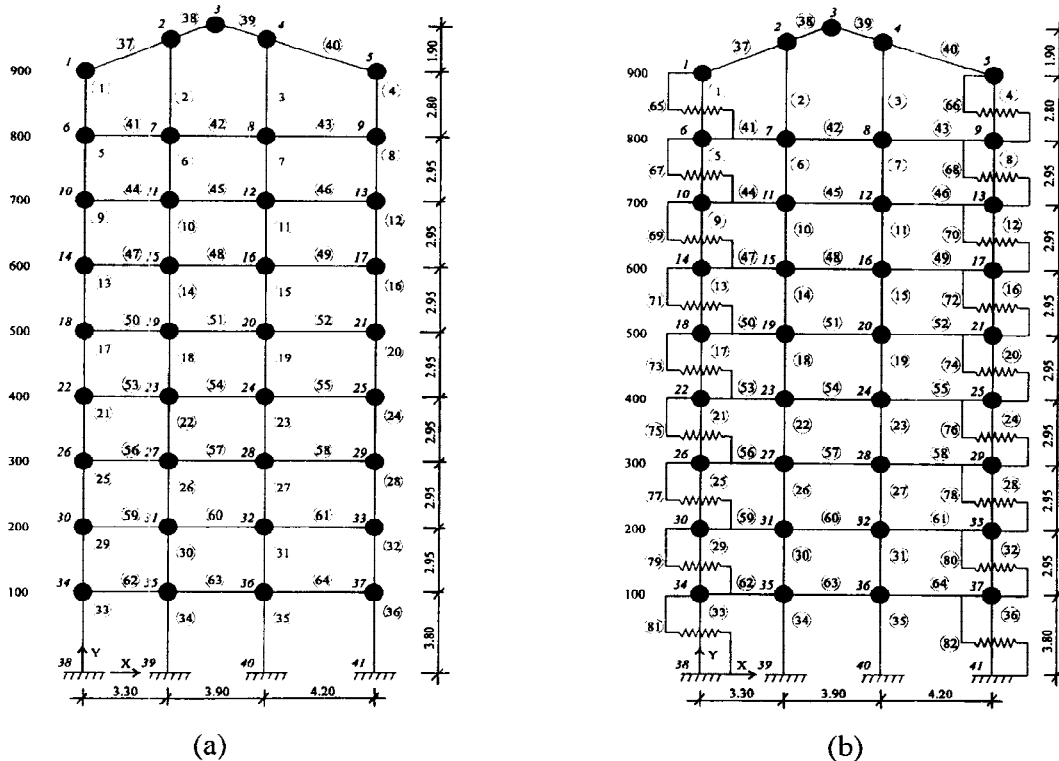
Formulated non-linear earthquake damage prediction models of a conventional structure: a) pure frame system, model M1; b) frame with brick masonry infill, model M2
